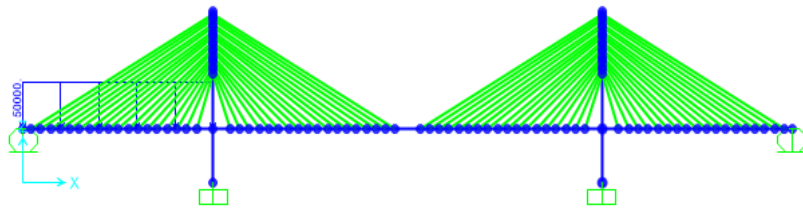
50kN/m Live Load at the Left Side Span of Bridge
